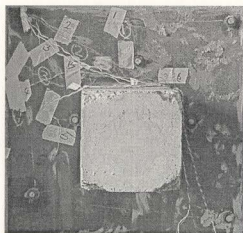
Steel gages locations on tension or compression steel reinforcement for different reinforcement ratios and cases of loading.
